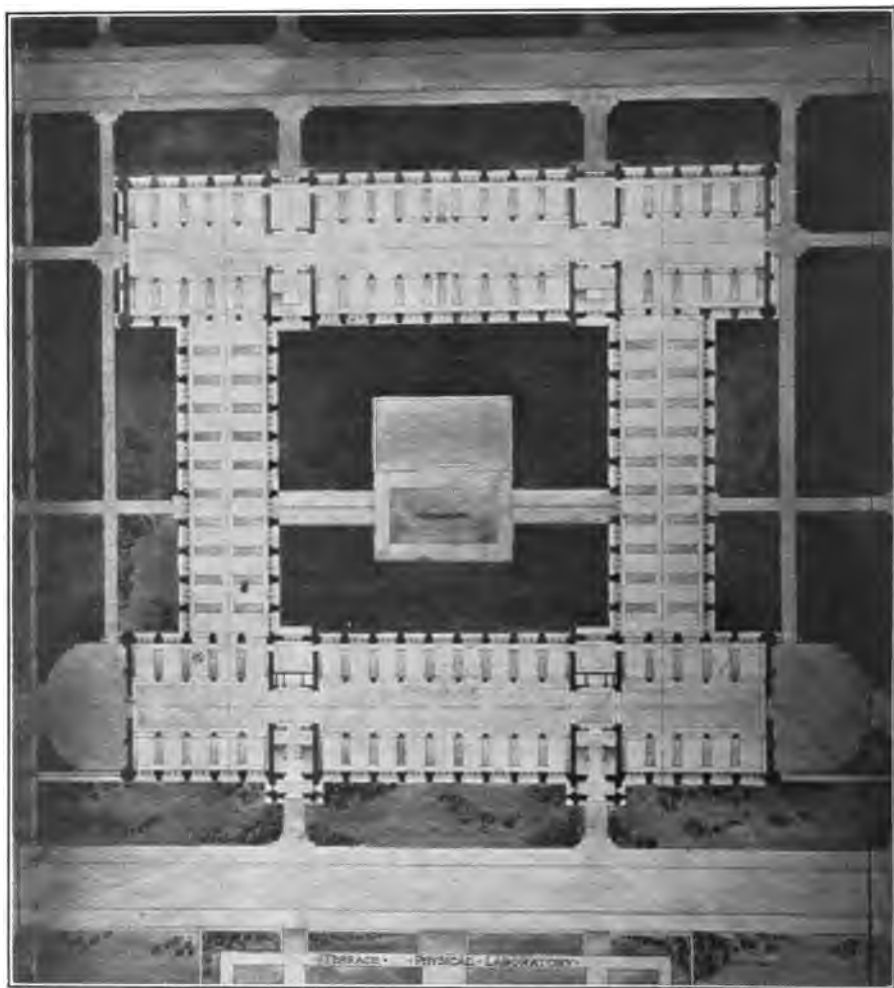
PRELIMINARY PLAN OF THE MUSEUM FLOOR OF THE NEW NATURAL SCIENCE LABORATORY, SHOWING, IN ITS LOWER PORTION, THE MAIN BUILDING FACING NORTH, AND THE PROPOSED EXTENSIONS TOWARD THE SOUTH, WITH THE VIVARIUM IN THE CENTRE OF THE QUADRANGLE.
